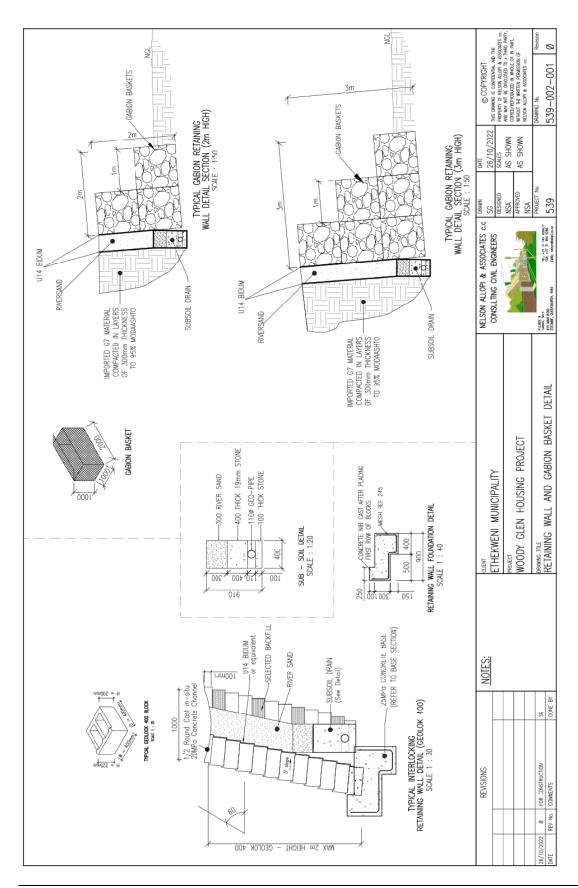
/002/001 – Retaining Wall & Gabion Basket Details
